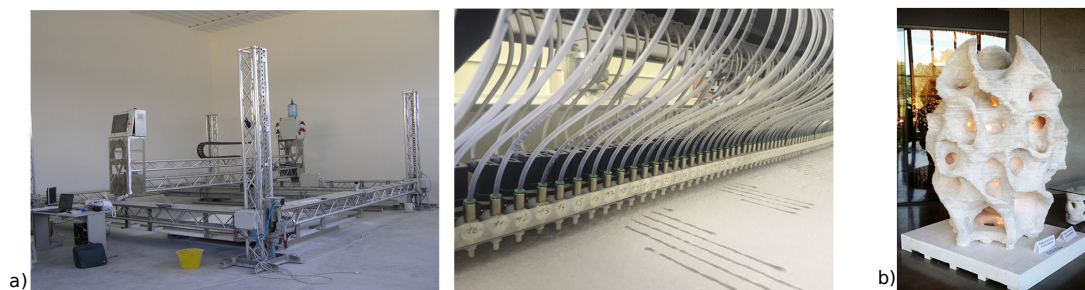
a) A schematic of the apparatus used for D-shape printing [13] b) A structure printed by D-shape printing [13].
